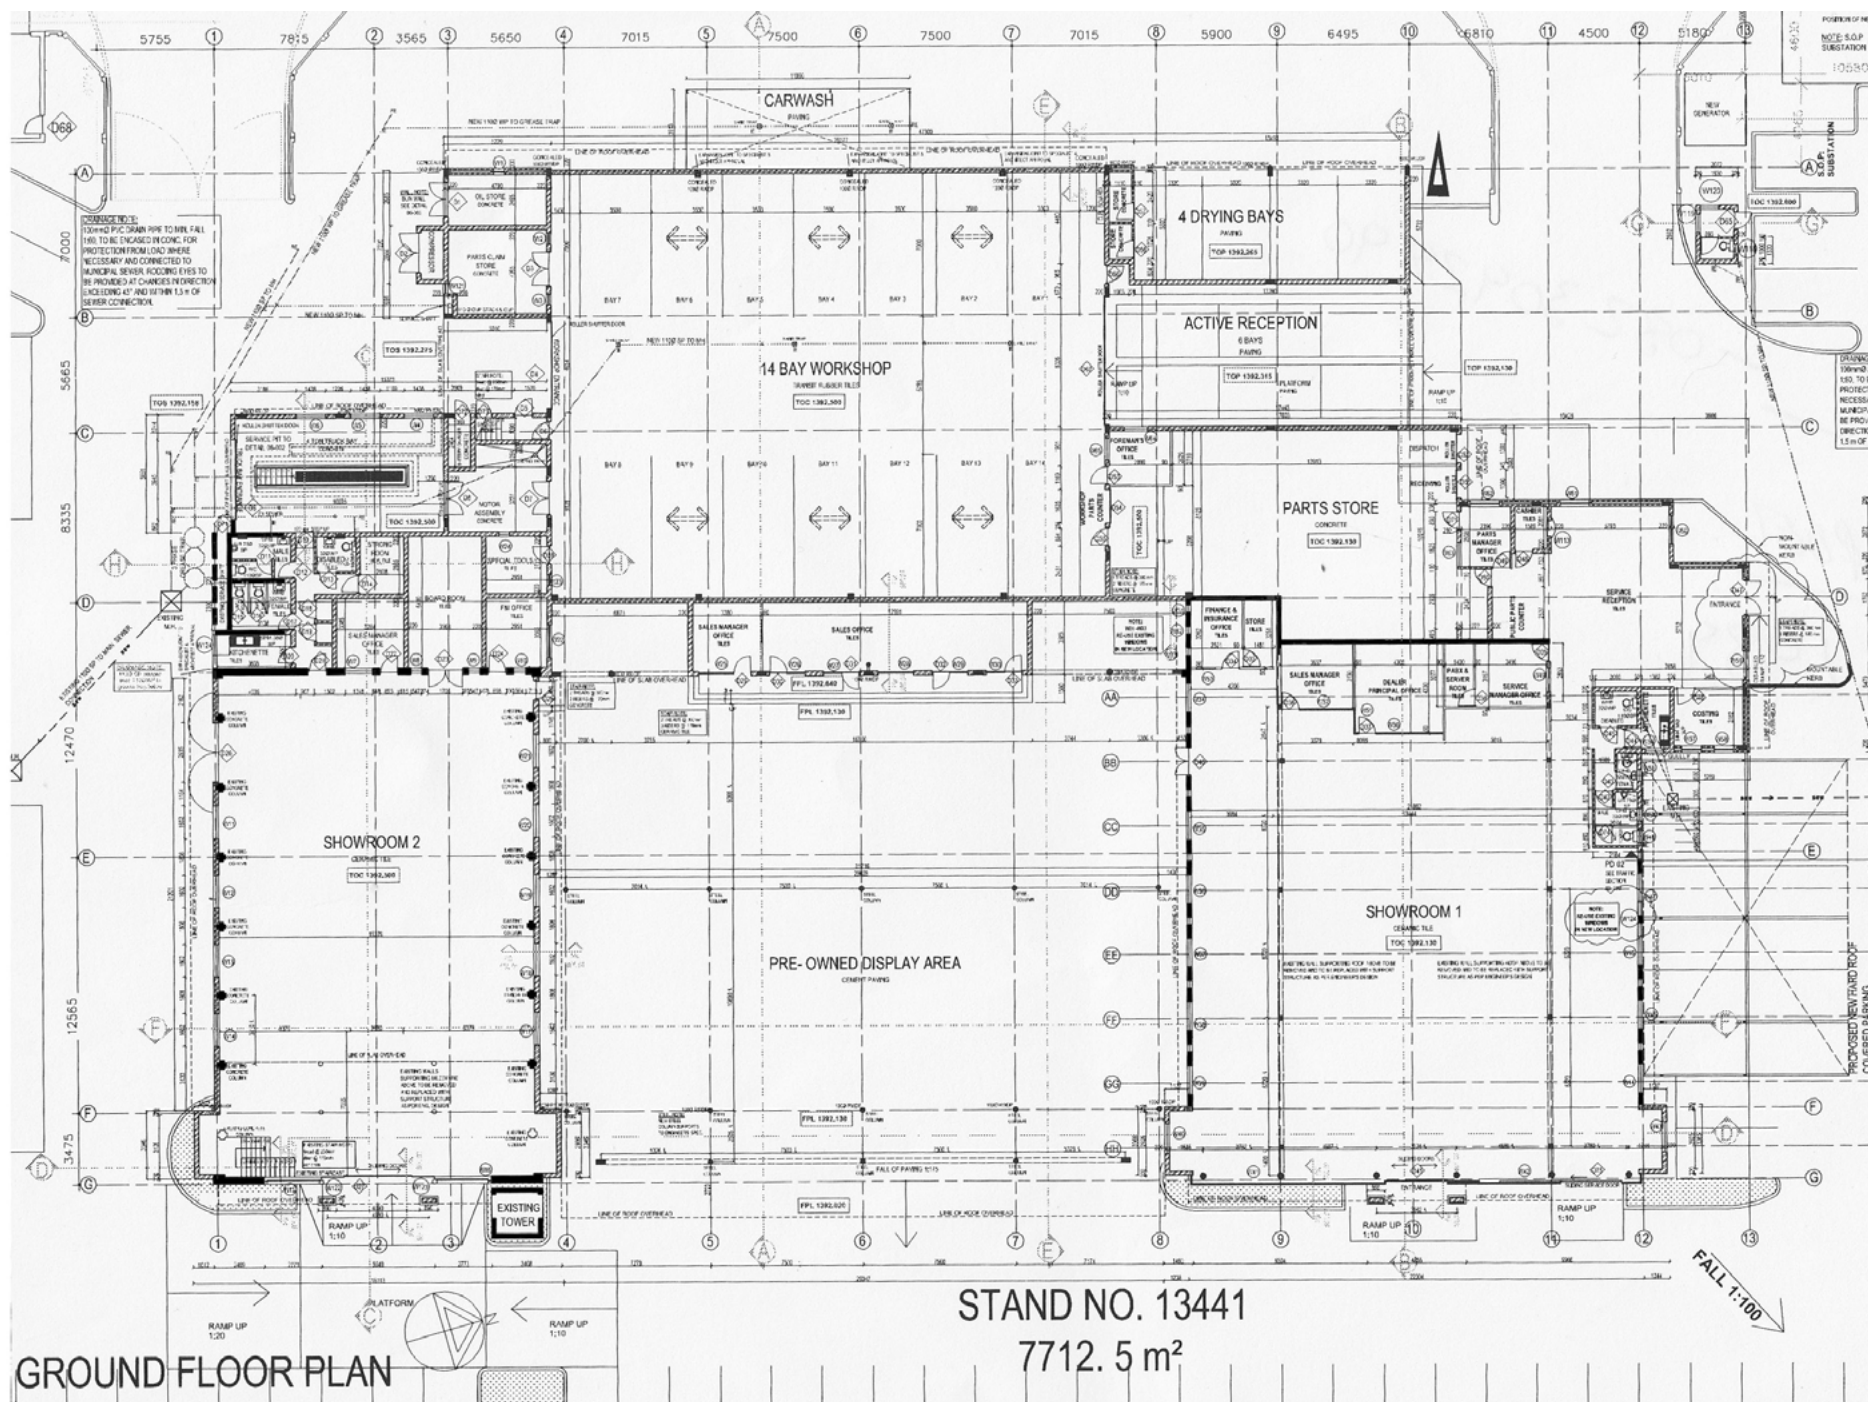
Ground floor plan of the Hyundai dealership (Gianni Loizos architects 2011)
